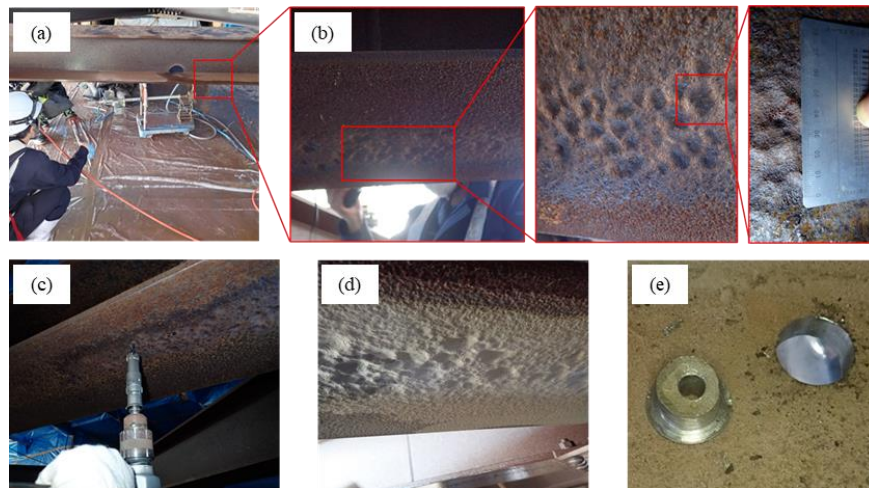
Implementation of AWT in severely corroded structures on-site: (a) Heavily corroded component, (b) Focused area of pitting corrosion, (c) Cutting with a hole saw pre-AWT, (d) Pitting corrosion area component post-AWT, and (e) Sample extracted using a hole saw.
